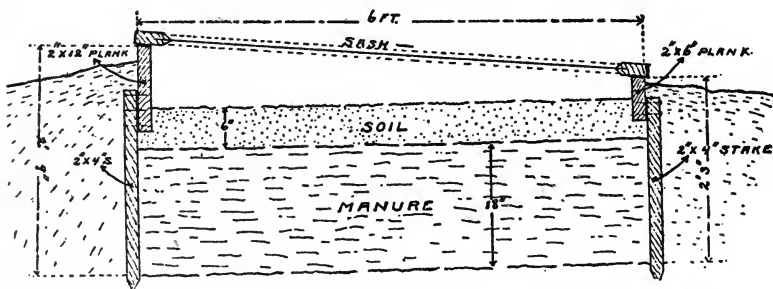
Sectional View of Hot-Bed Construction and Filling.
